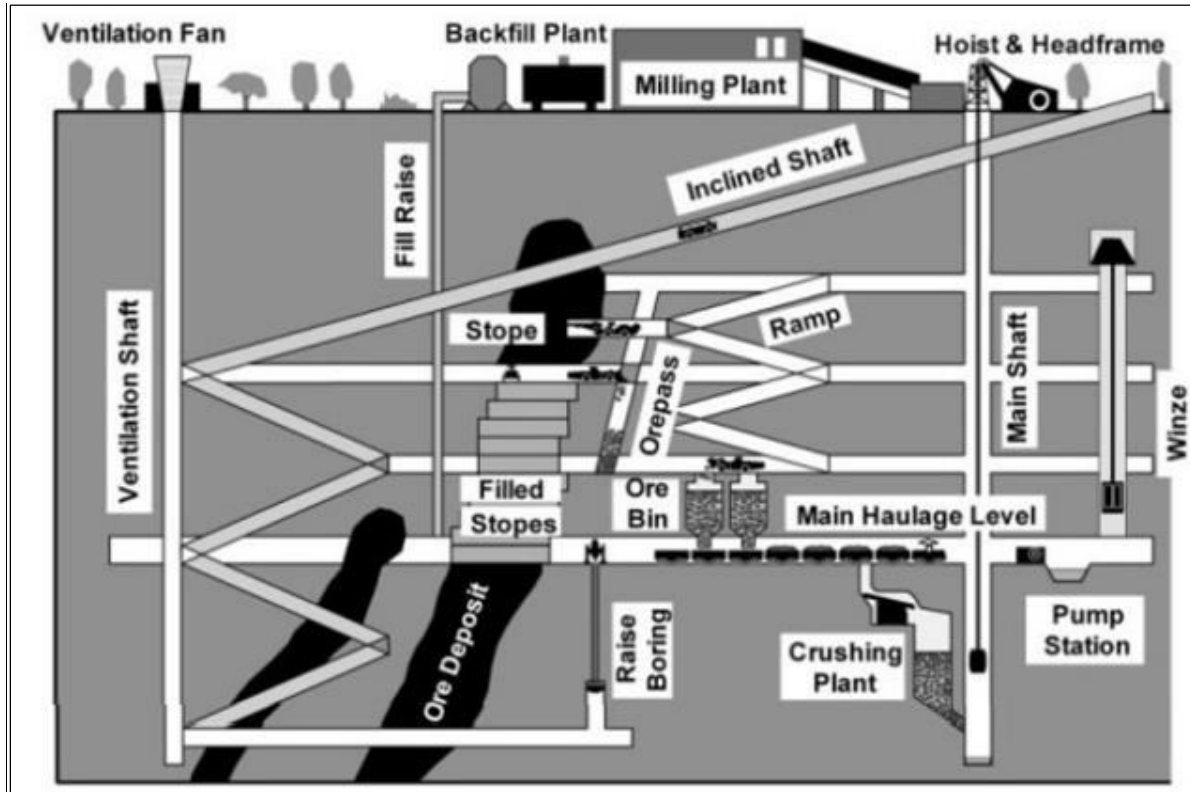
An example layout of an underground mine (Okubo and Yamatomi, undated)
